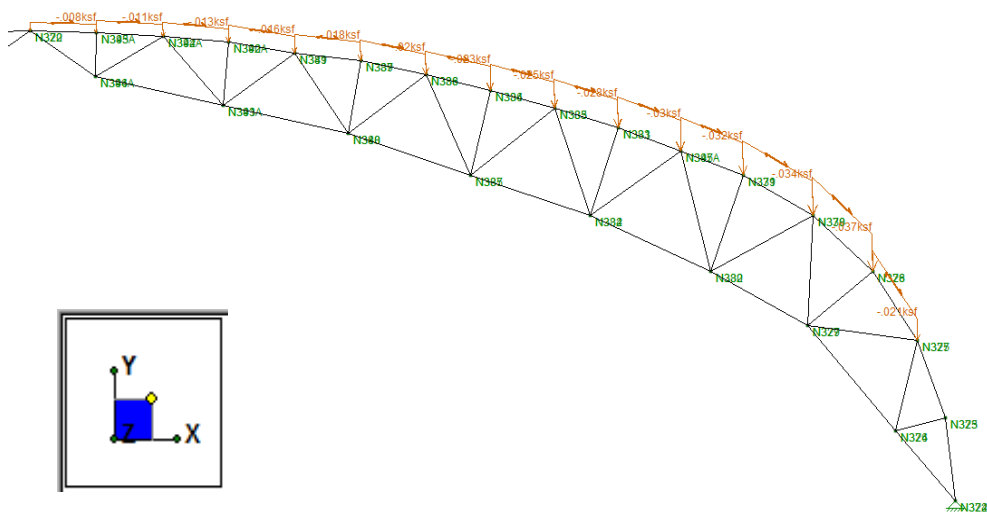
Snow Load-Unbalanced - Area Loading on Hangar Q - Elevation
